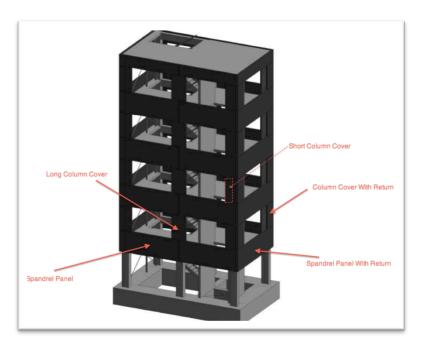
Computer rendering of the building showing different types of concrete cladding walls. (Drawing by Diana Lin)
